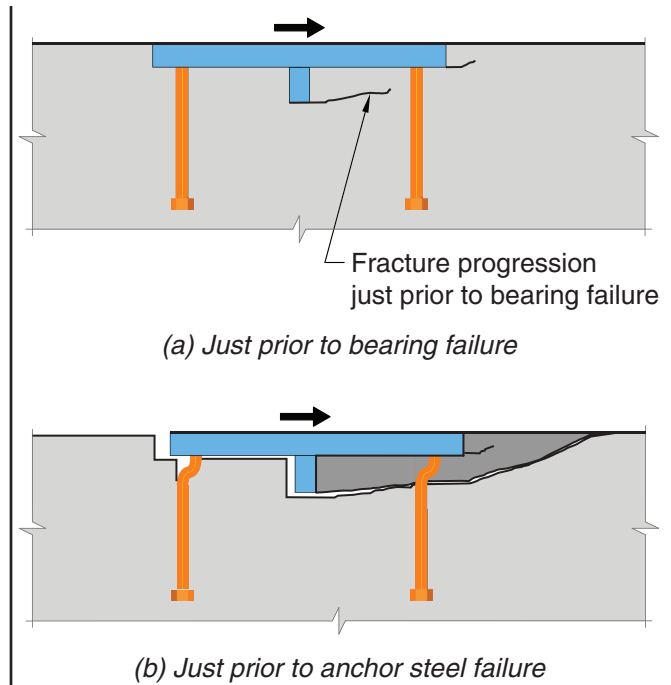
Bearing failure and subsequent anchor steel failure for embedded plate with shear lug (if concrete breakout is not applicable)
